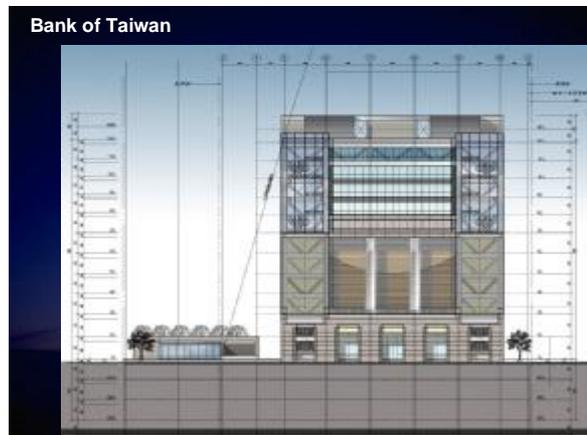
(a) Applications of VD and floor isolation to Bank of Taiwan
